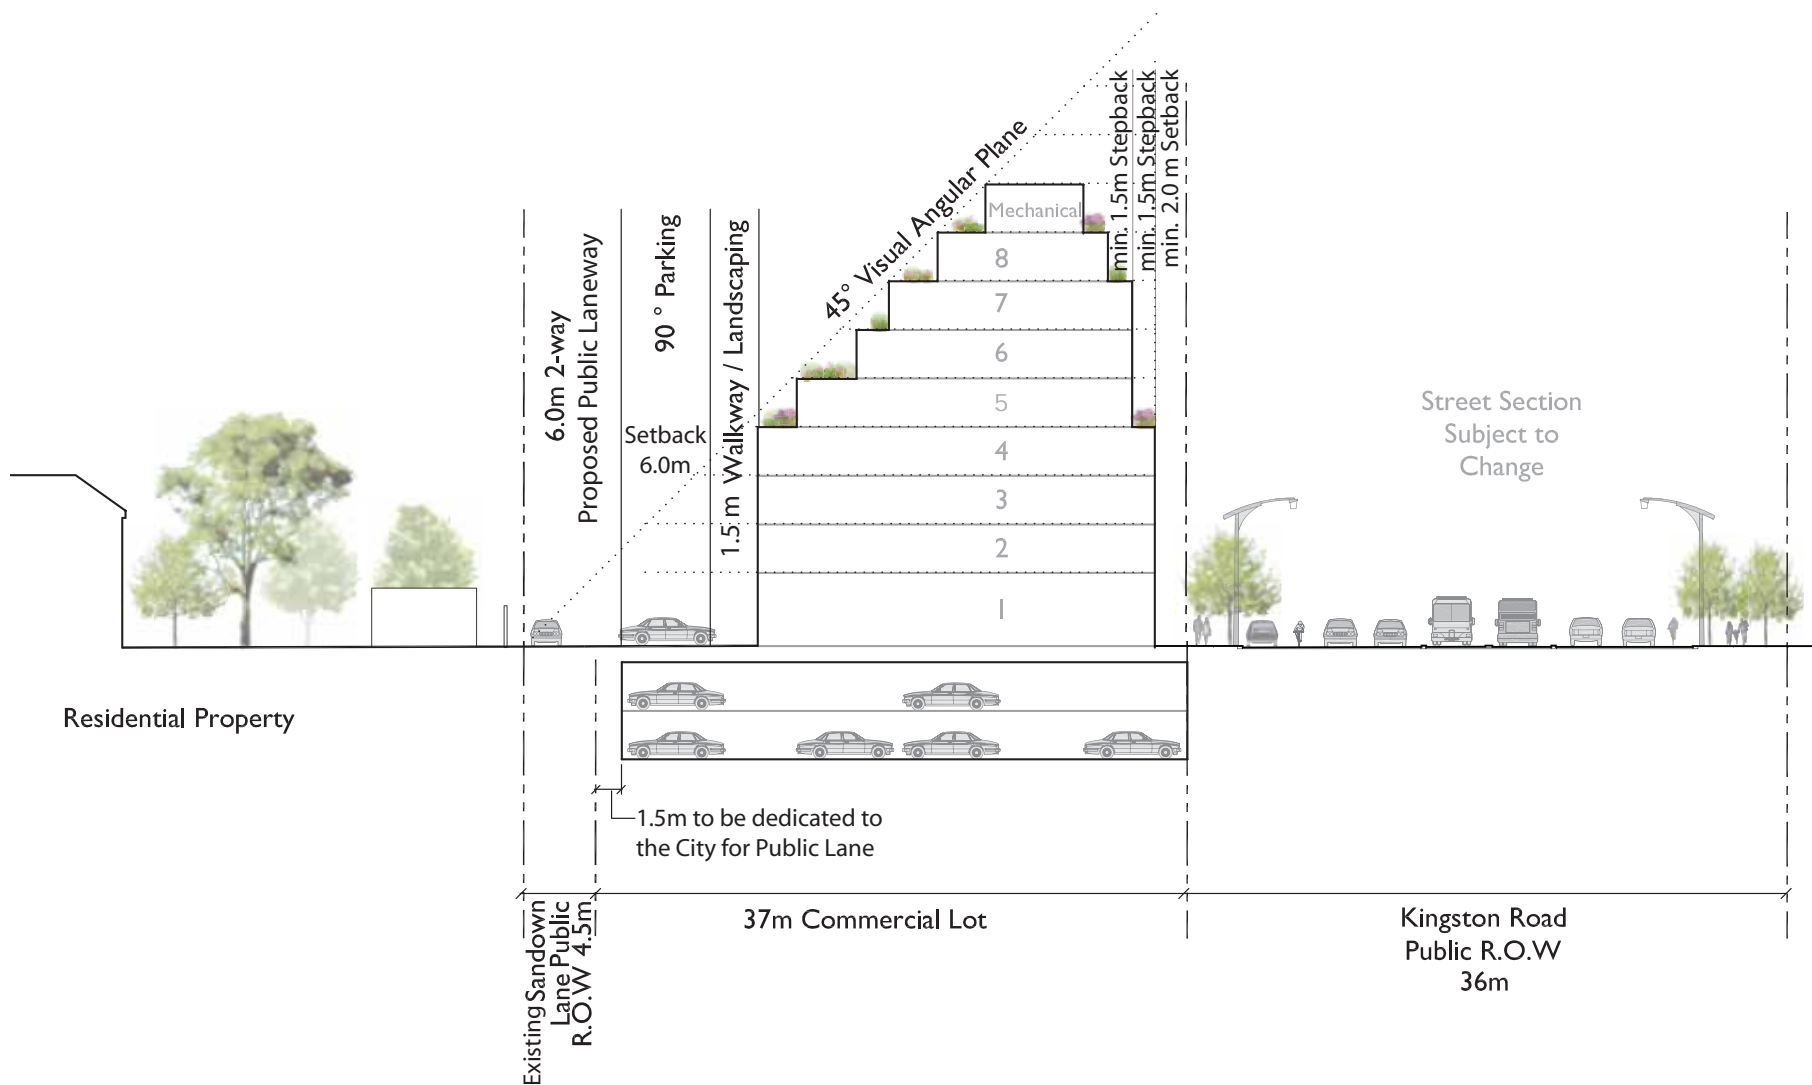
Recommended Typical North Side Building Envelope (Mid-block)
